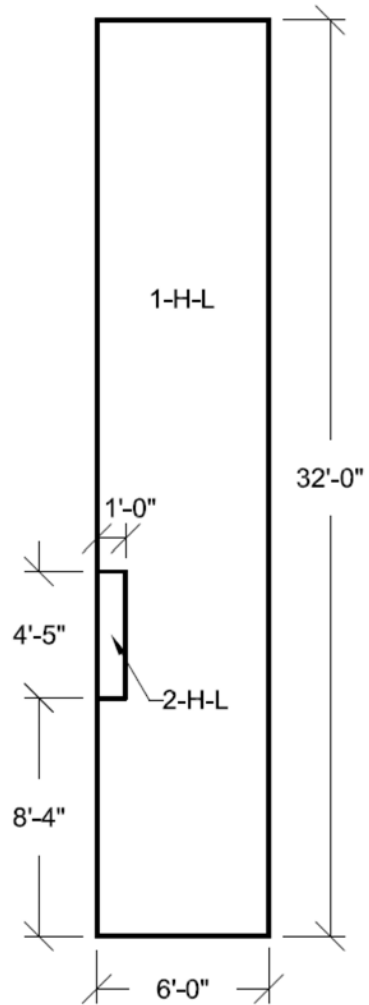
H.6-153 DGFOV Slab 3 Looking Down
